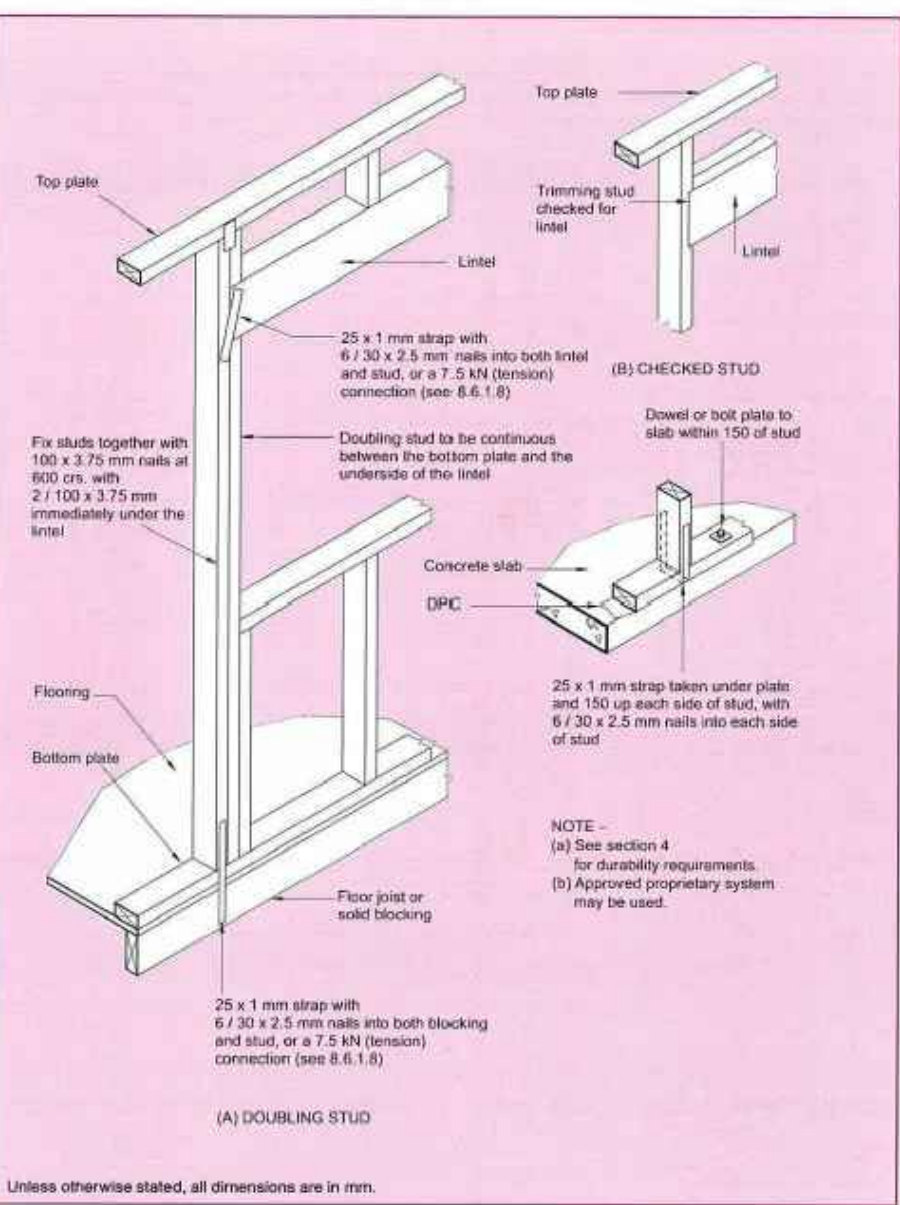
Lintel fixing to prevent uplift (see 8.6.1.8 and table 8.14 (a) and (b))
